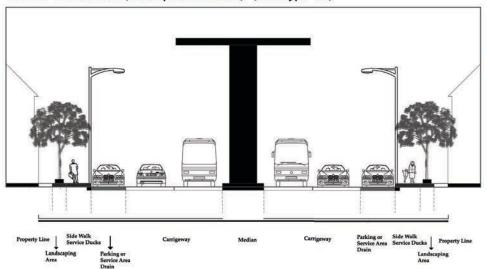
Cross section of a Level 01 –General Road (With a parallel LRT line) – (Road Type - 1–A)
